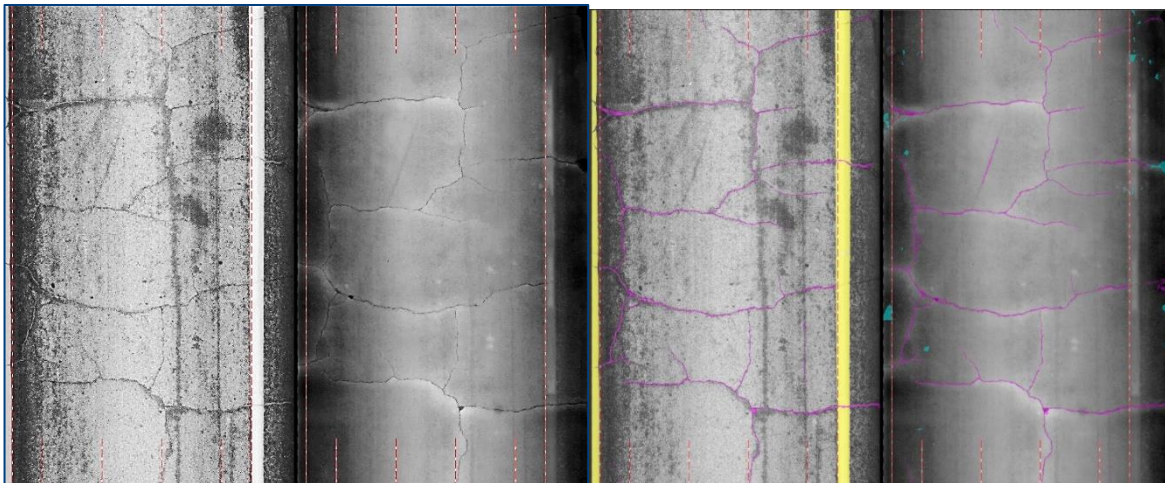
3D Pavement Images (left) and Software Identified Cracks (in purple)
